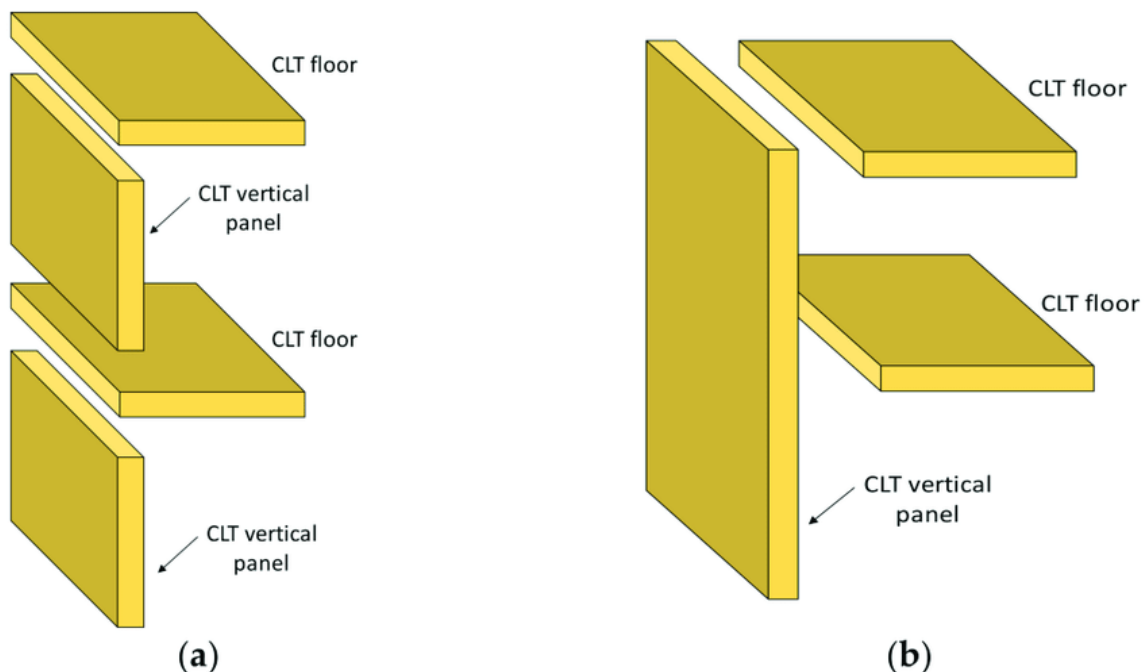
Construction techniques for CLT buildings: (a) platform frame, (b) balloon frame (Sandoli, 2021)
